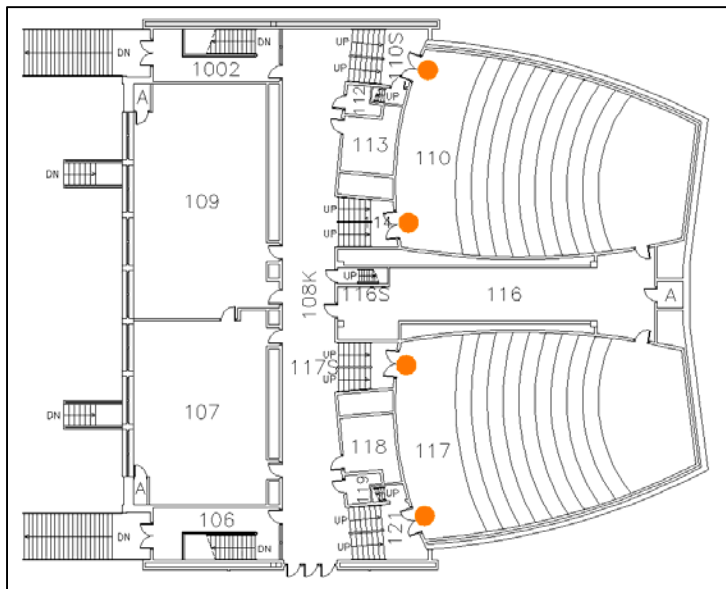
Floor plan showing the case study building's lecture wing and sensor locations.
